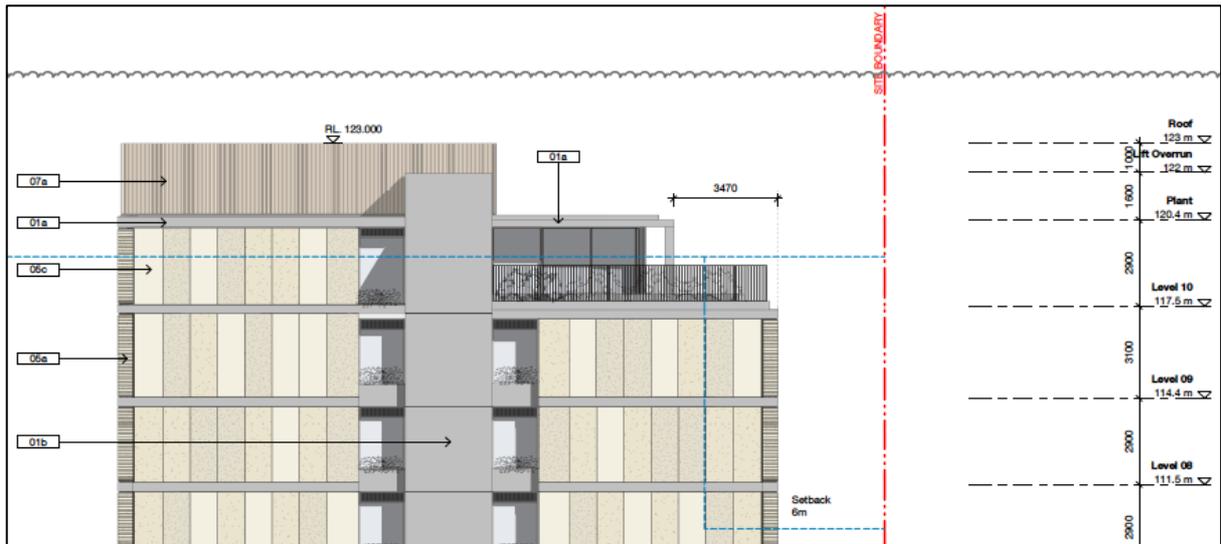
Proposed Southern Stair as Viewed from the Southern Elevation Looking North
